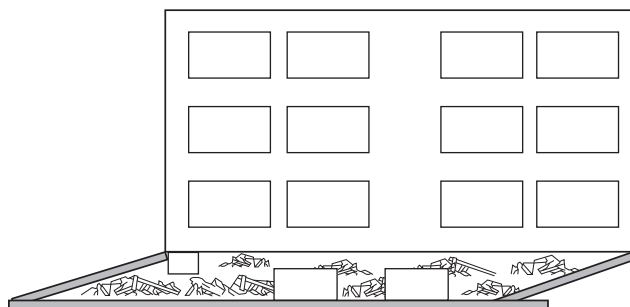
(a) Offset Collapse Pattern — Light Frame Construction.
